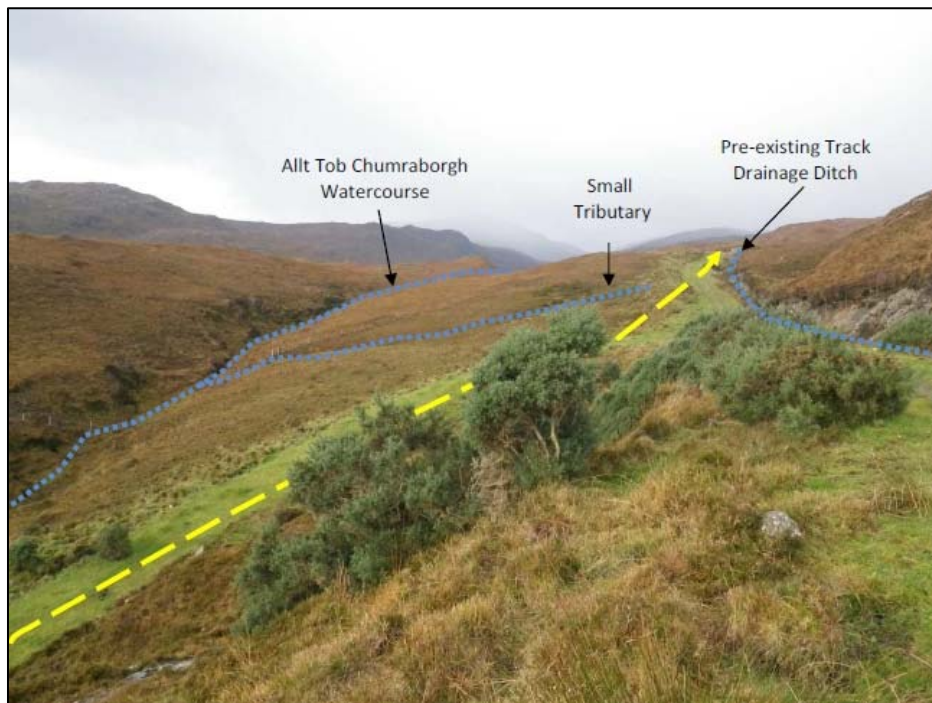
View northeast from shore to gently sloping land and the proposed access route to windfarm from the construction berthing facility
